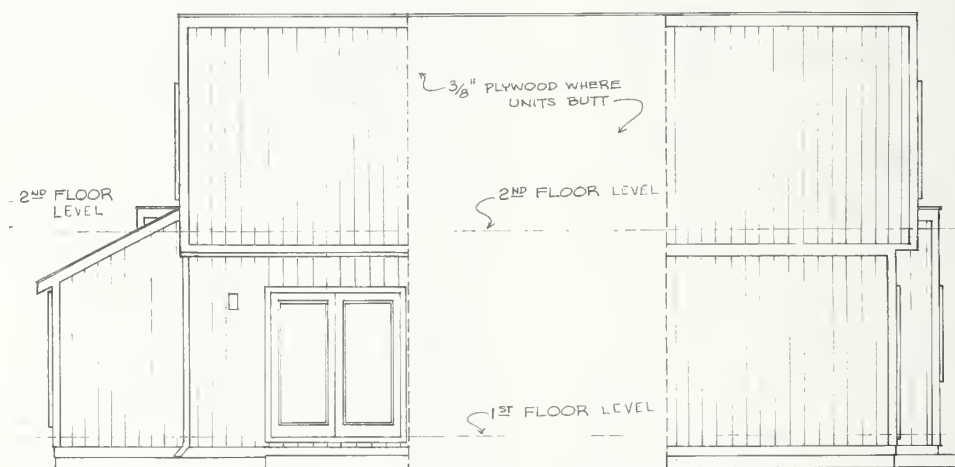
Side elevation of test house showing space for party wall for adjacent unit.
